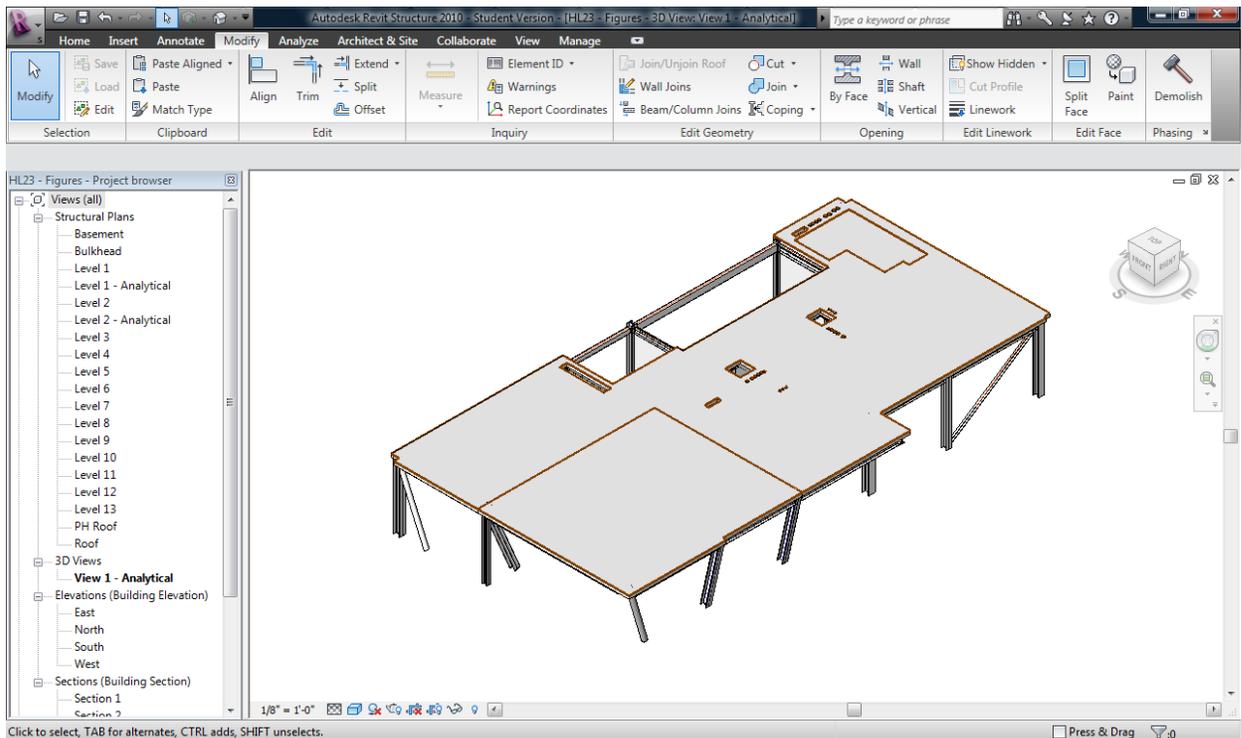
A 3D View of the Vertical Openings in a Structural Floor
